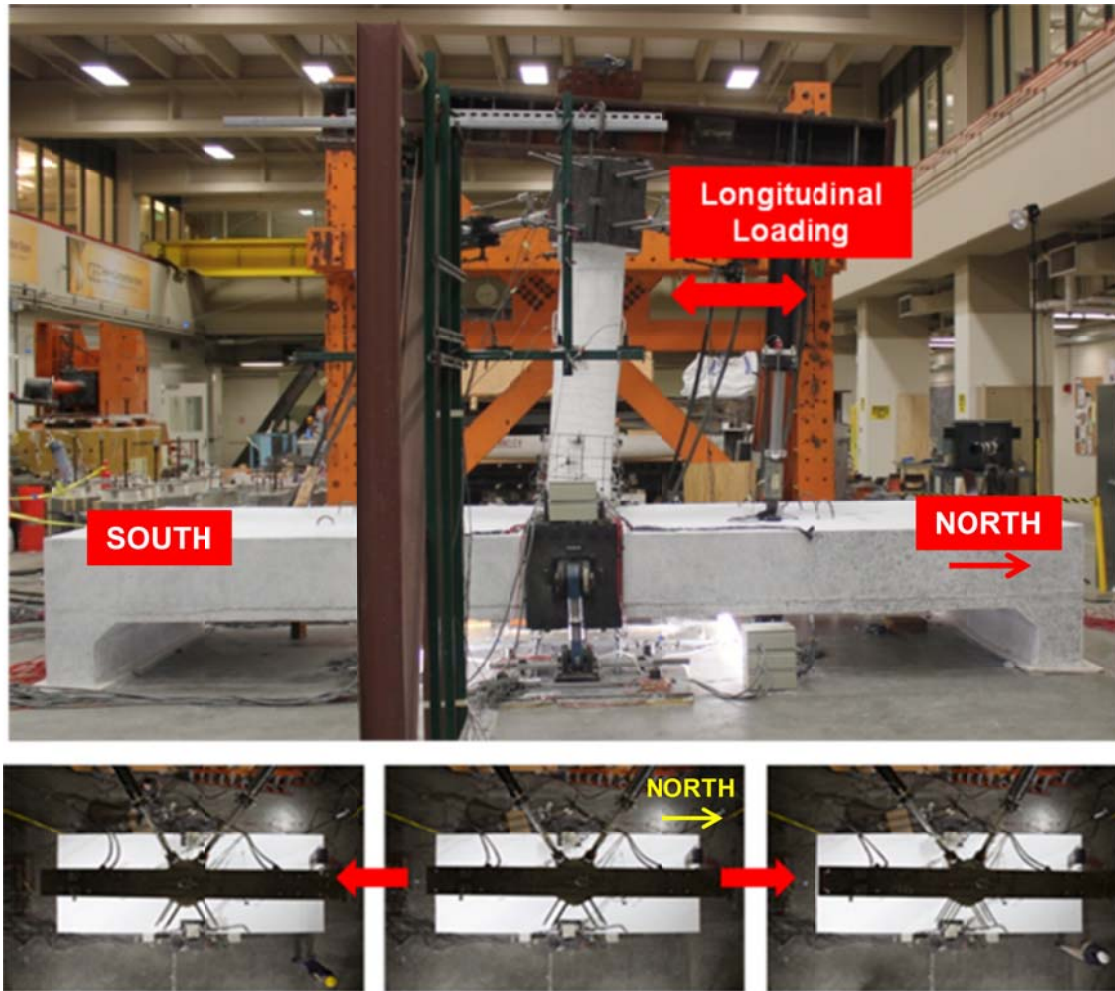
As-built SP1 test setup and progression of loading in the longitudinal direction
